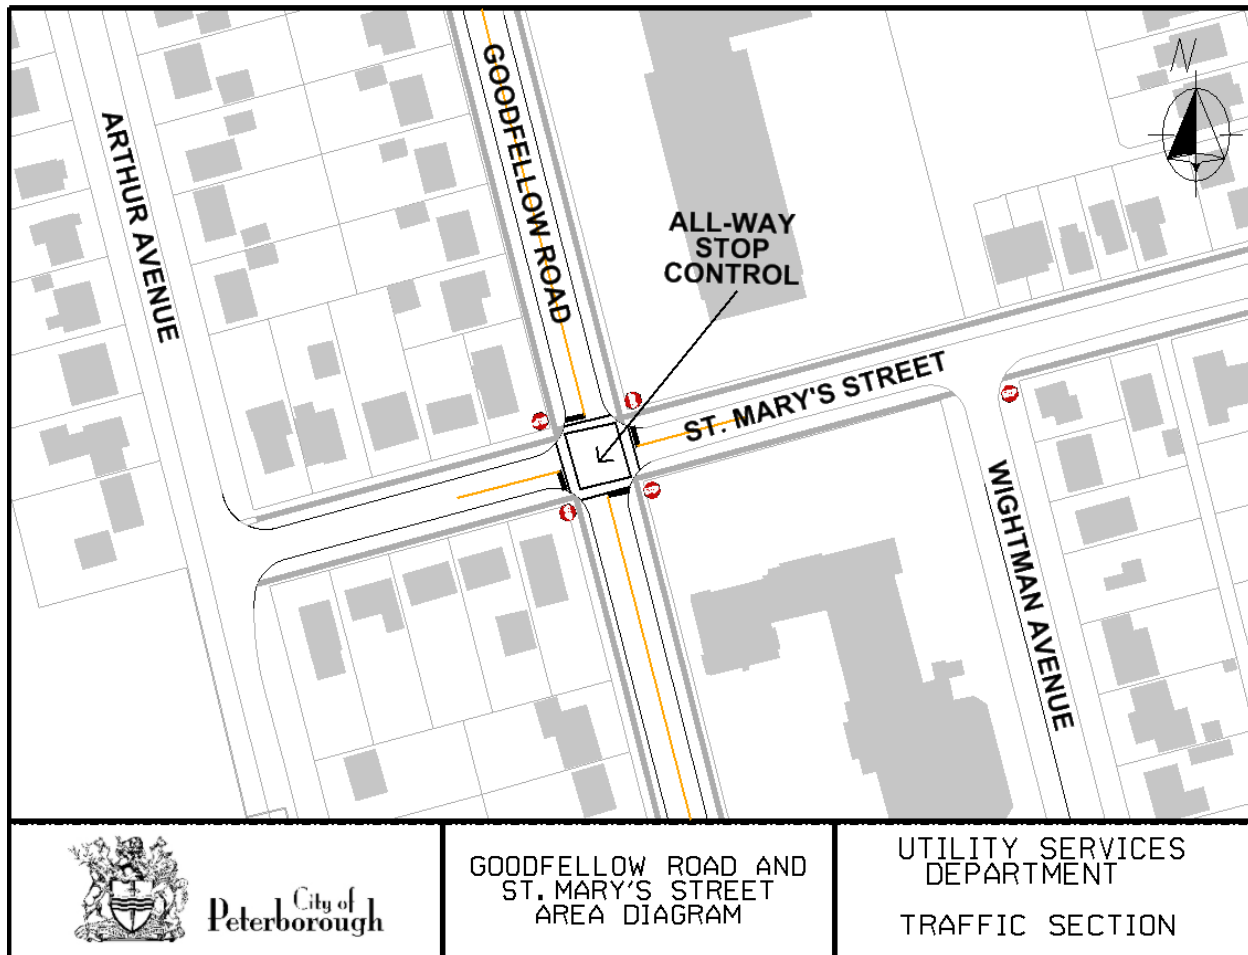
Goodfellow Road and St. Mary's Street Intersection
